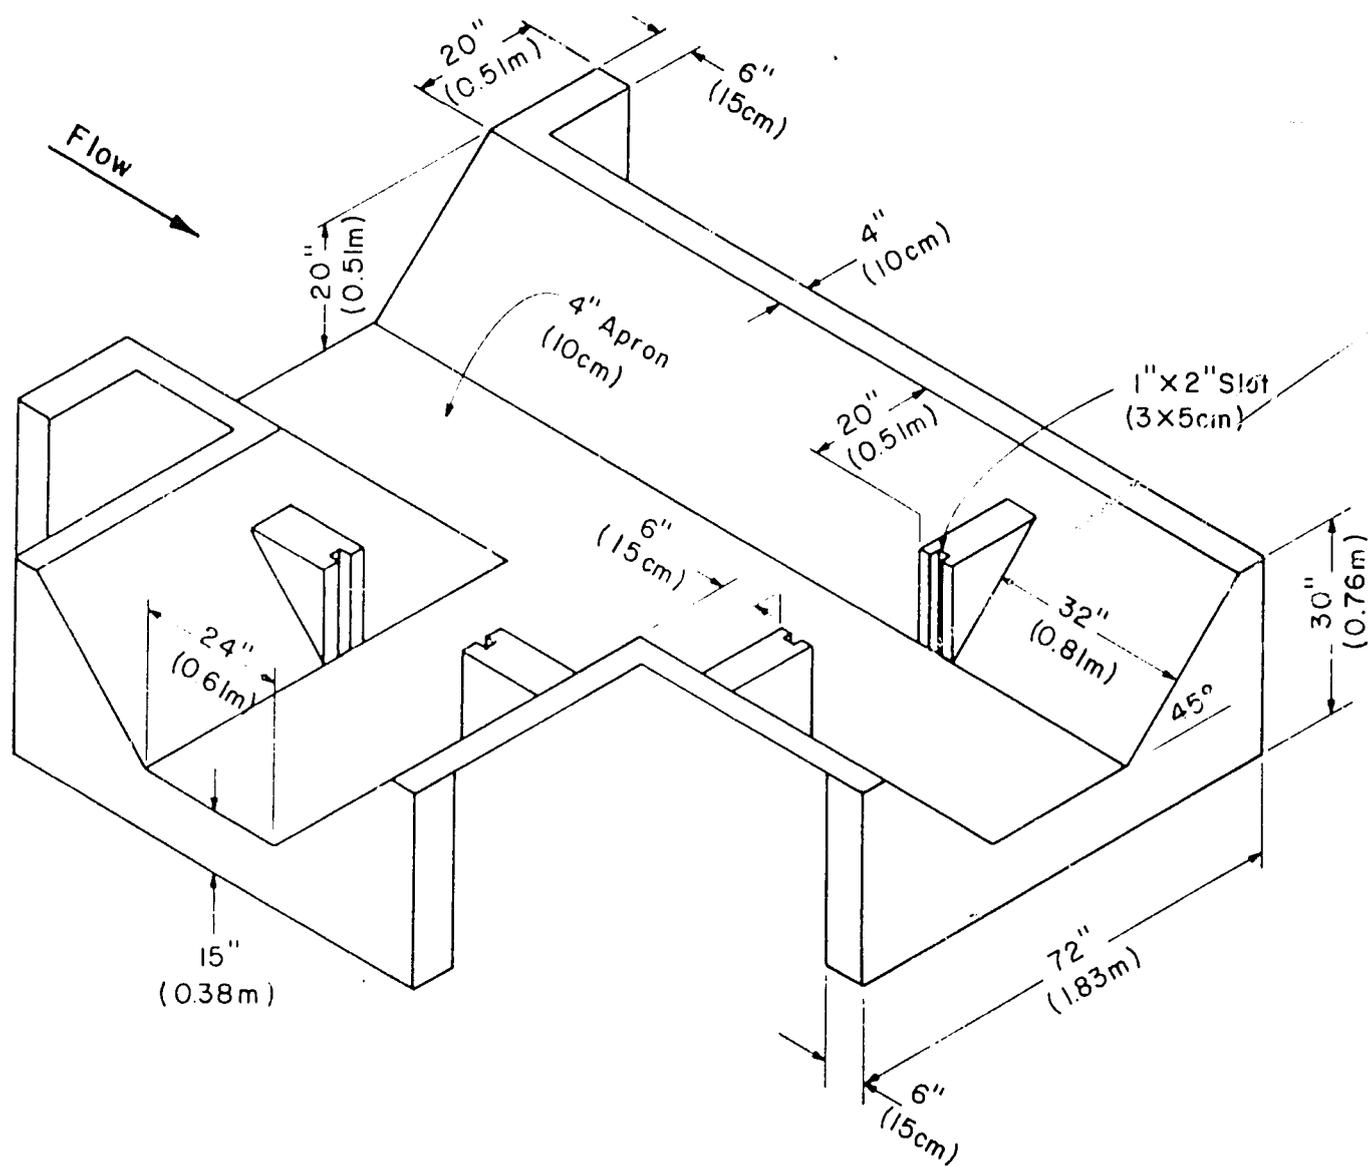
Concrete trapezoidal two-way divisor (14). (See Plate 2, Appendix 2).
